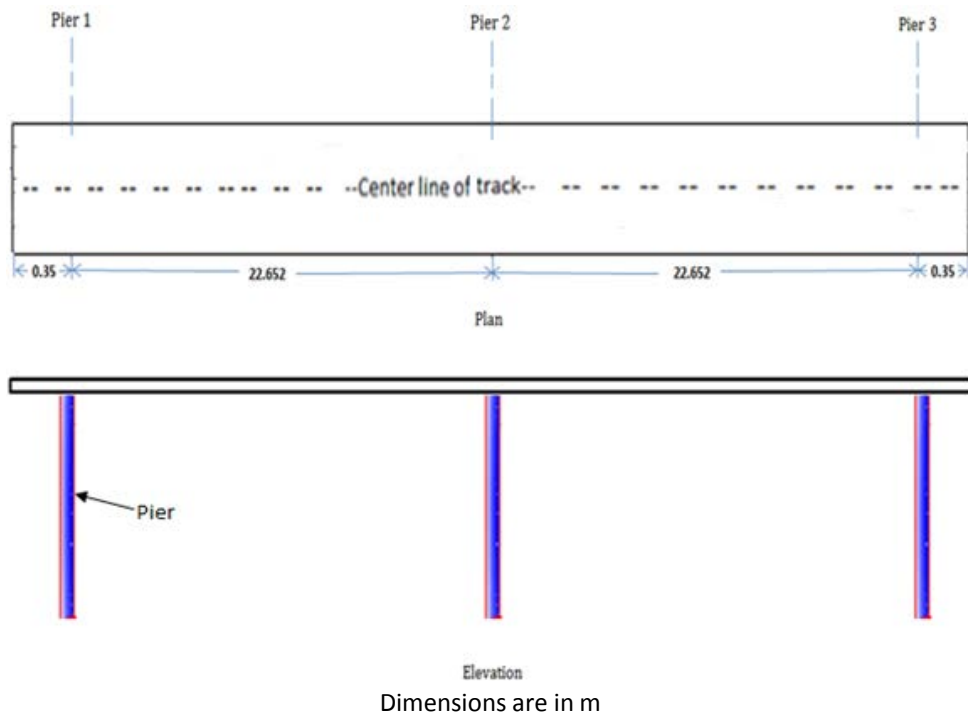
Typical Plan and Elevation, 46.004m two-span continuous
